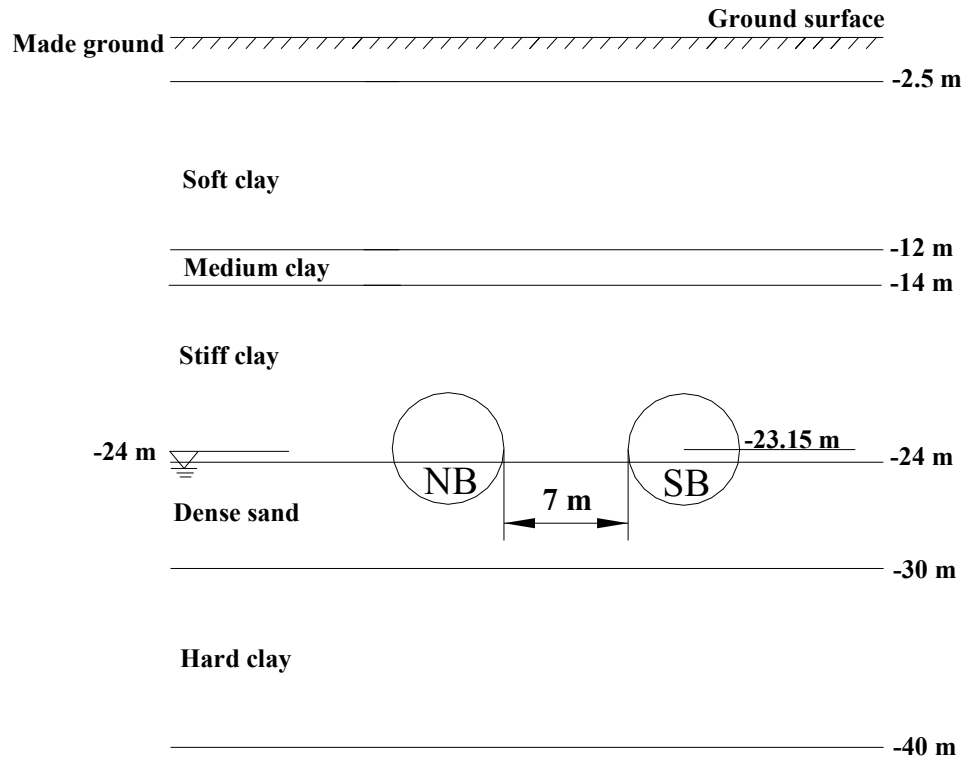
(d): Soil Profile of Section 6D (Sirikit to Sukhumvit)
